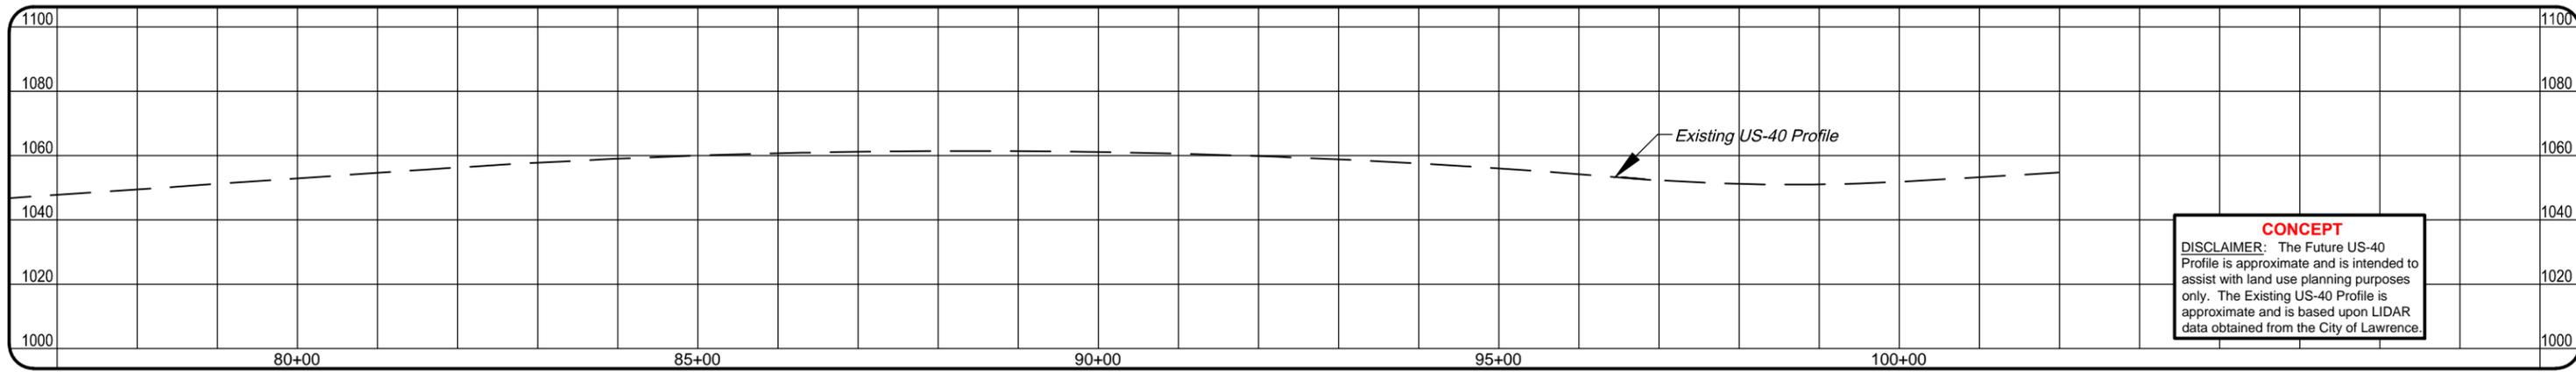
Long Term (2040) Plan & Profile 3 of 4
